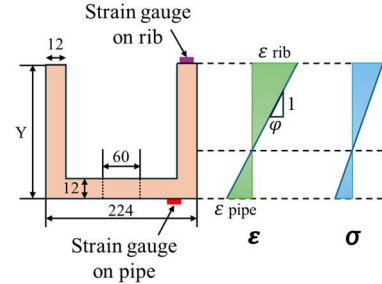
Strain and stress profile of pipe reinforcement (units: mm)
